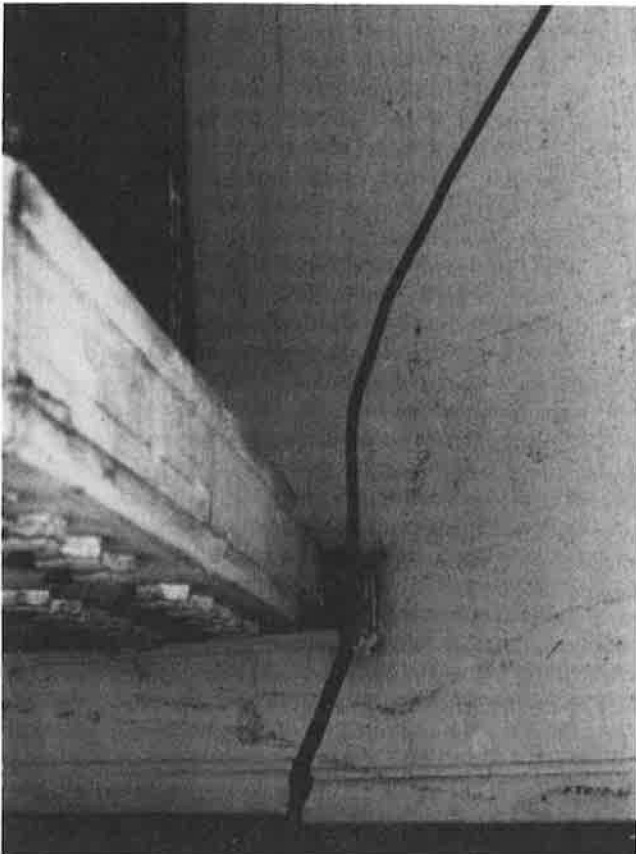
Crack in box girder web at intersecting flange tip.
